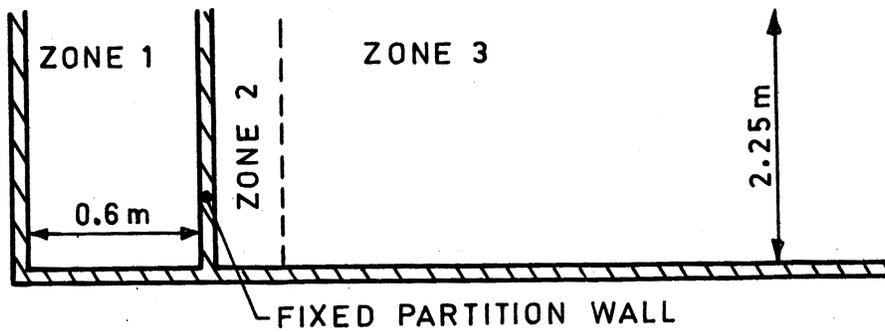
ZONE DIMENSIONS (ELEVATION)
